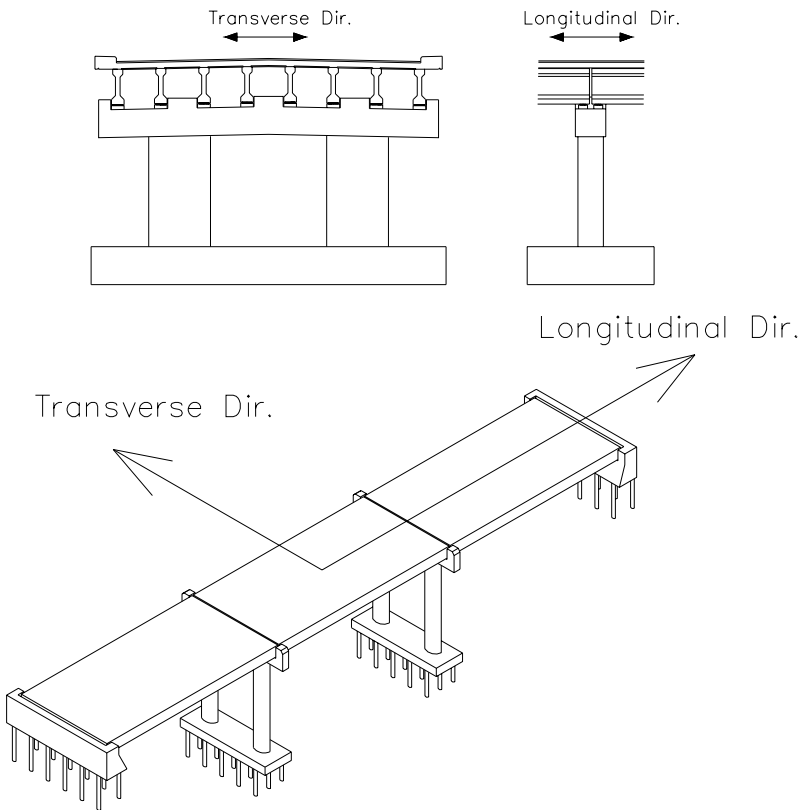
Longitudinal and transverse directions in the bridge modeling
